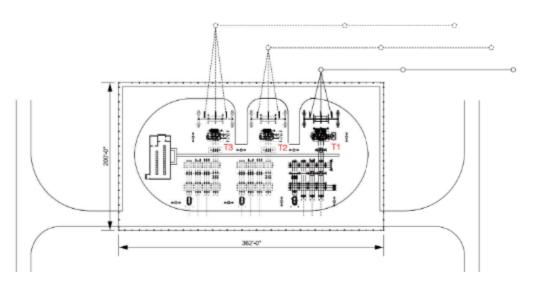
PROPOSED SUBSTATION ARRANGEMENT
